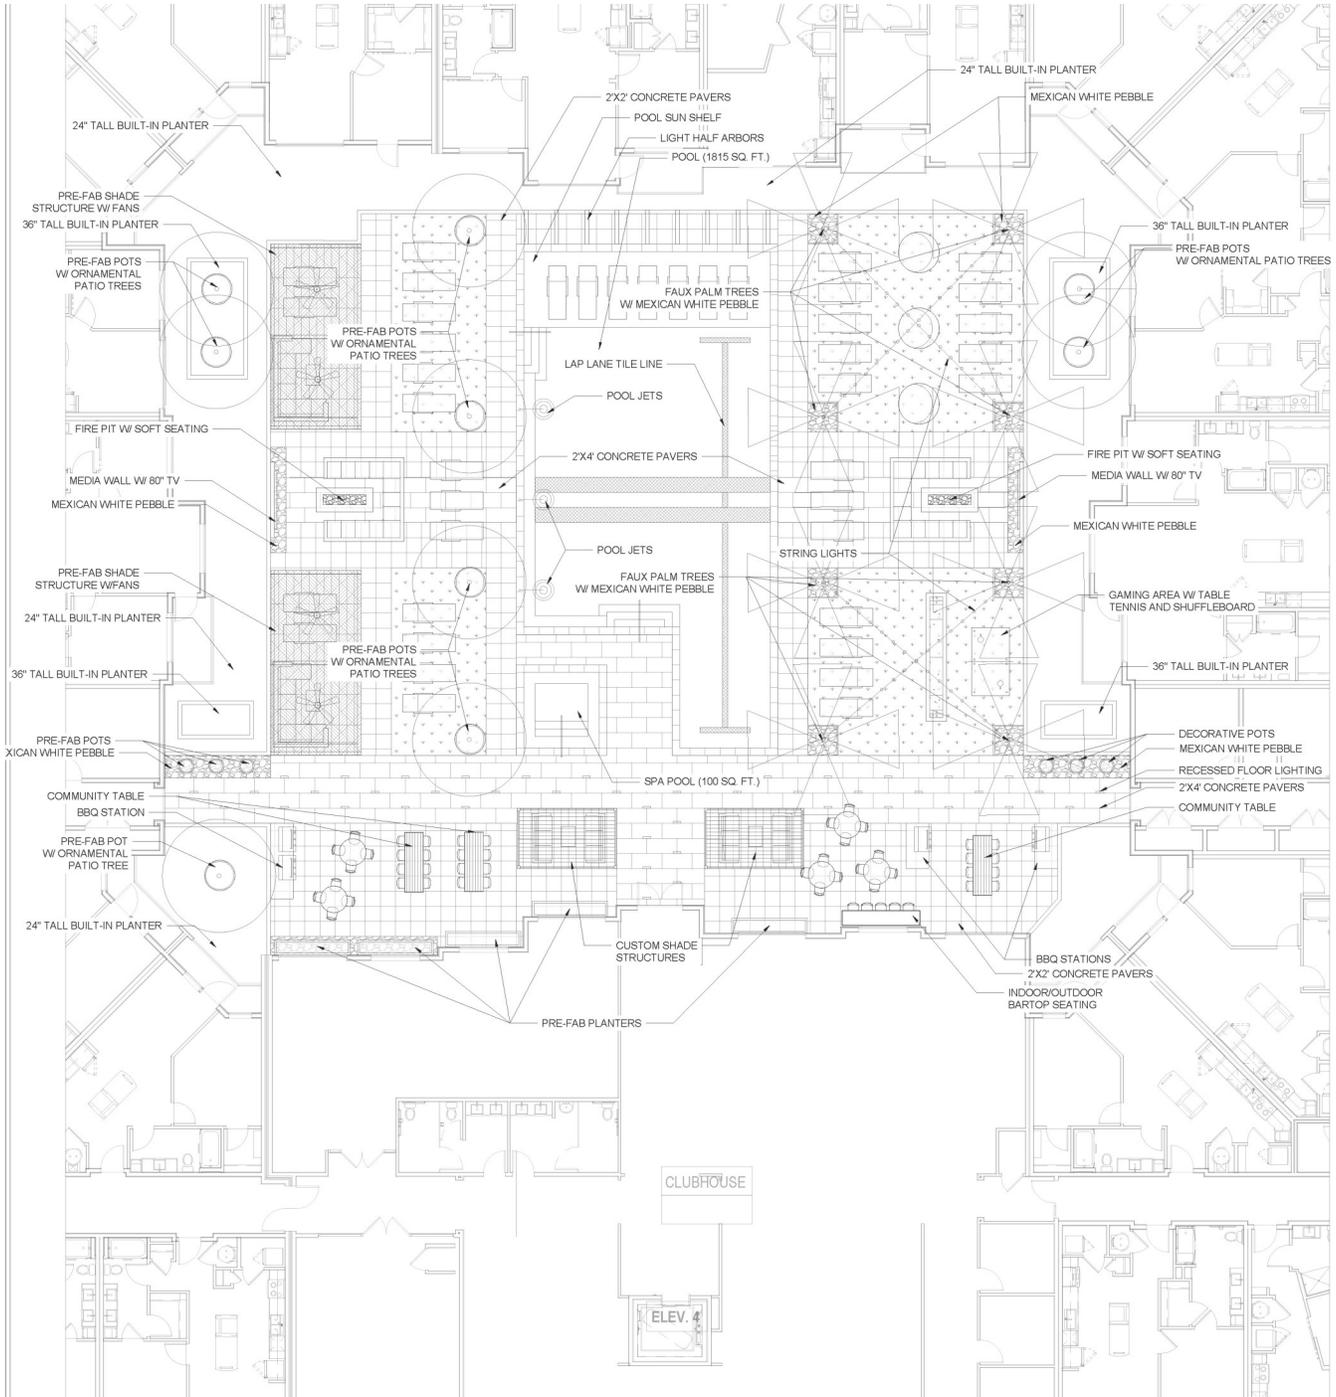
EXHIBIT C: LANDSCAPING PLANS (CONT.)
